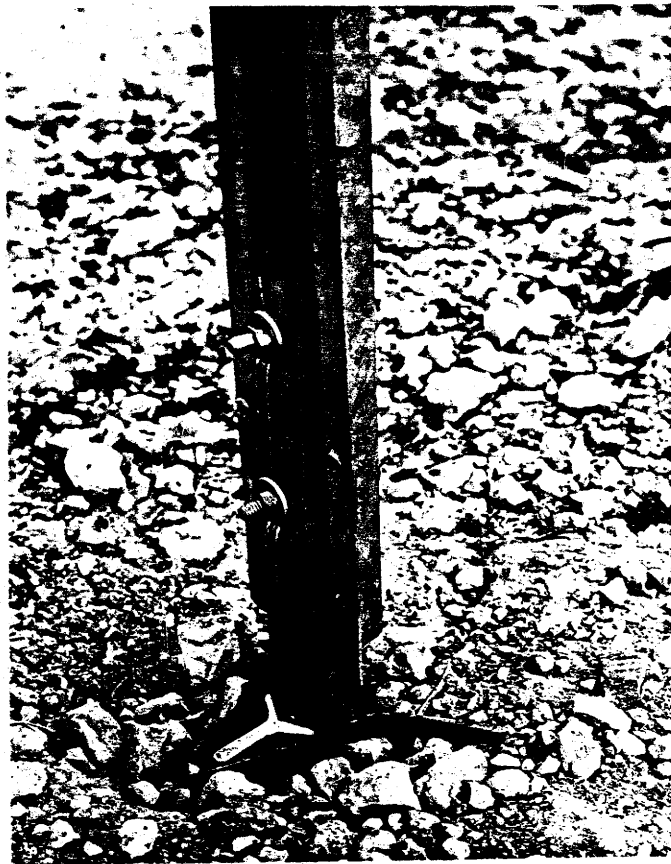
Test 1B Detail of V-Loc Socket Installation.
